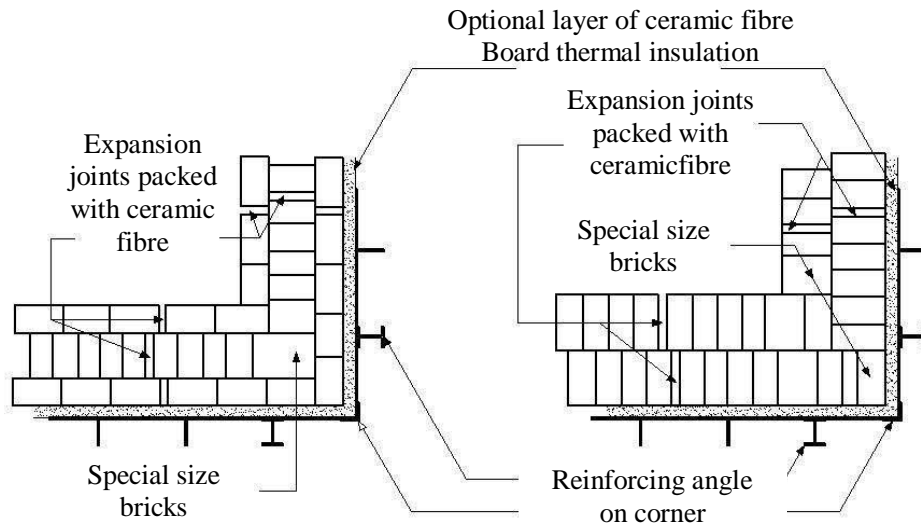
Lining arrangement of the furnace using bricks. (Mullinger and Jenkins, 2008)
